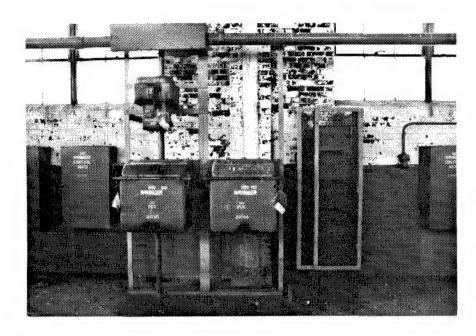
Building 105-1: Contactor for the Motor Room located on the fourth floor of a Nitrating House.
